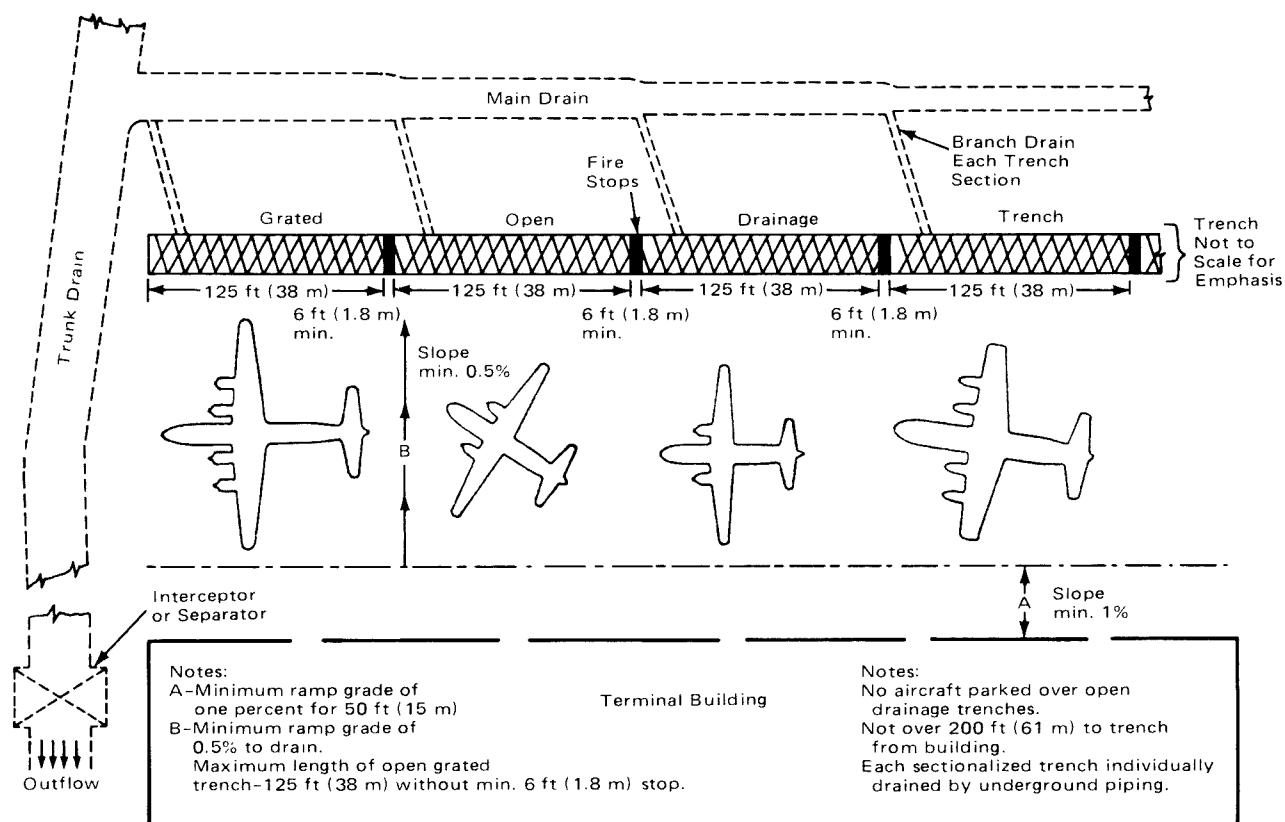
(b) Another possible arrangement of an aircraft fueling ramp drainage system using a grated open drainage trench.
